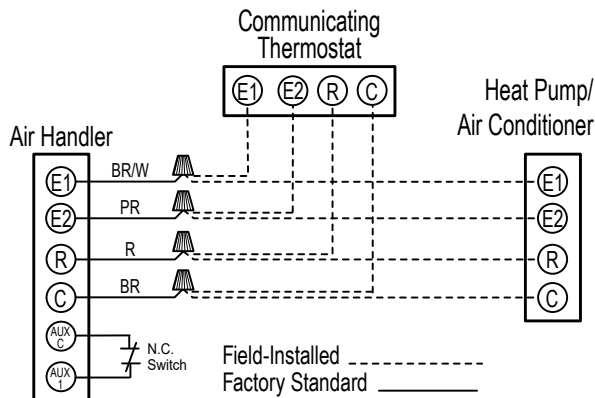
Thermostat Wiring for Heat Pump with Air Handler
